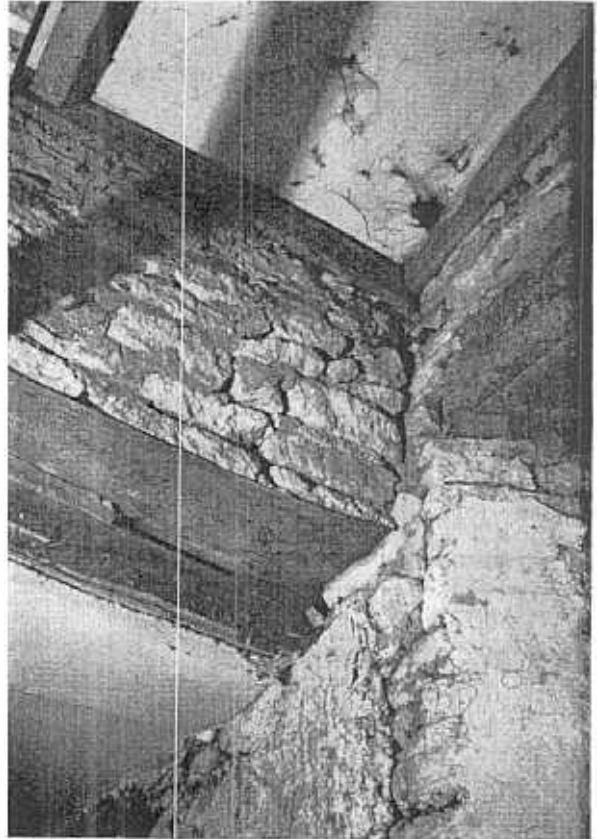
The great weight of masonry supporting the attic floor, chimney and roof which was found to be bearing upon an oak board, one inch thick. This was greatly deflected and upon the point of collapse.
